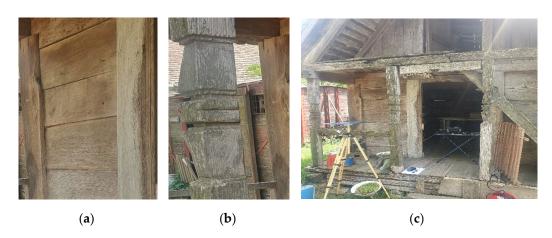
Photos of a wooden house: (a) details of the wall; (b) details of the column; (c) facade view.
